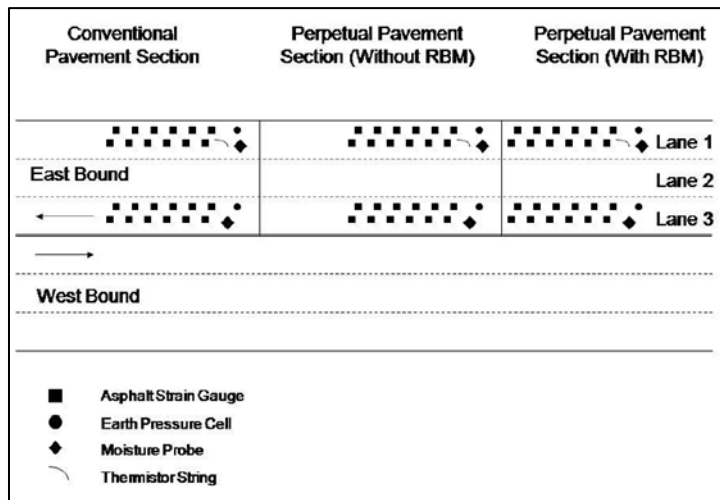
Highway 401 test section instrumentation schematic (El-Hakim, 2009)
